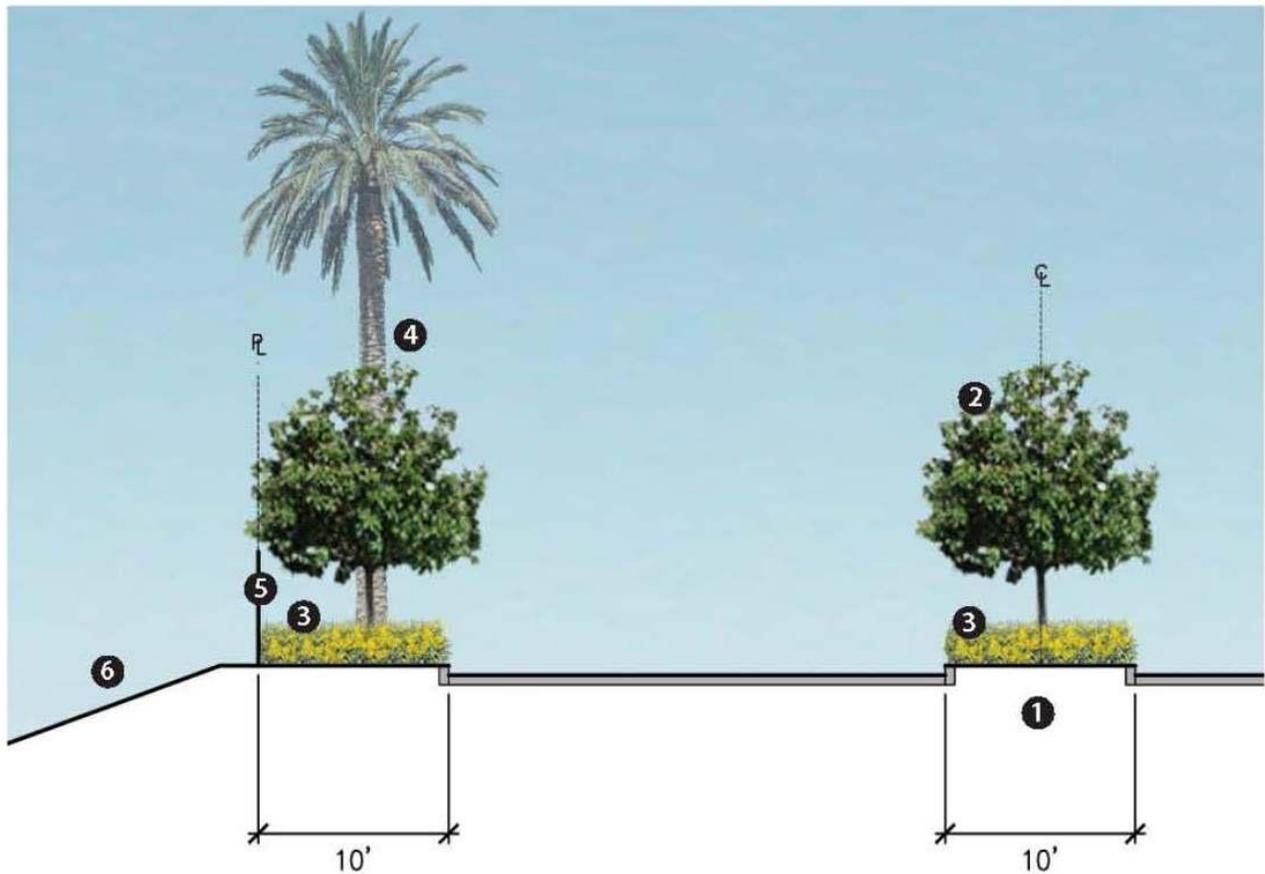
Internal Connector Road Past First Intersection at Building Facade or Parking Structure
